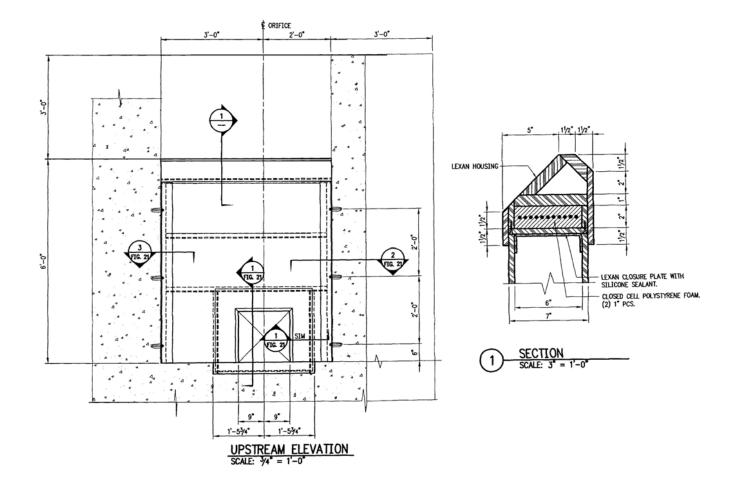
Orifice/ Weir Antenna Housing - Elevation and Section (Structural Fiberglass)
